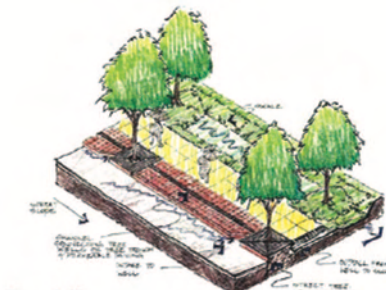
Street Tree Wells as Detention Basins for Sidewalk Runoff (Within Restricted Right of Way)
